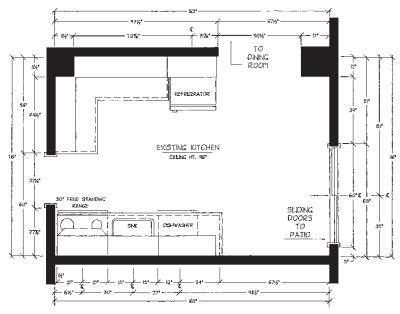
Kitchen design begins with an accurate, ¹/₂-inch-scale drawing of the space, showing all walls, openings, and structural features. Existing cabinet layout doesn't need to be represented.
